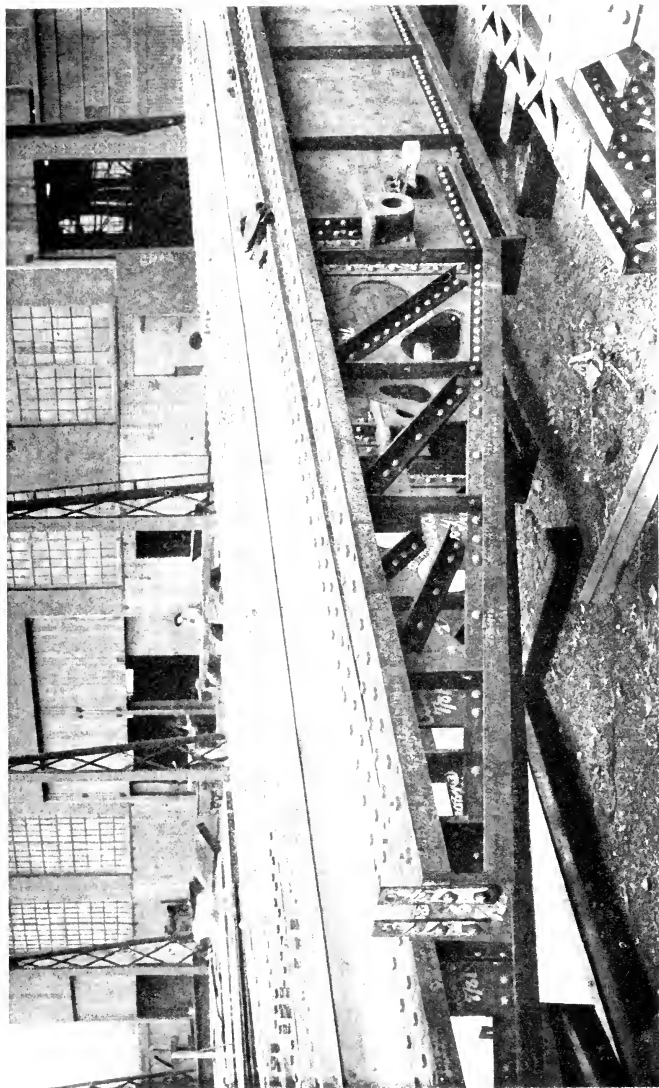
BOYLSTON STREET BRIDGE. BRACKET END OF TYPICAL FLOOR BEAM OF NEW CITY BRIDGE BEFORE CONCRETING
